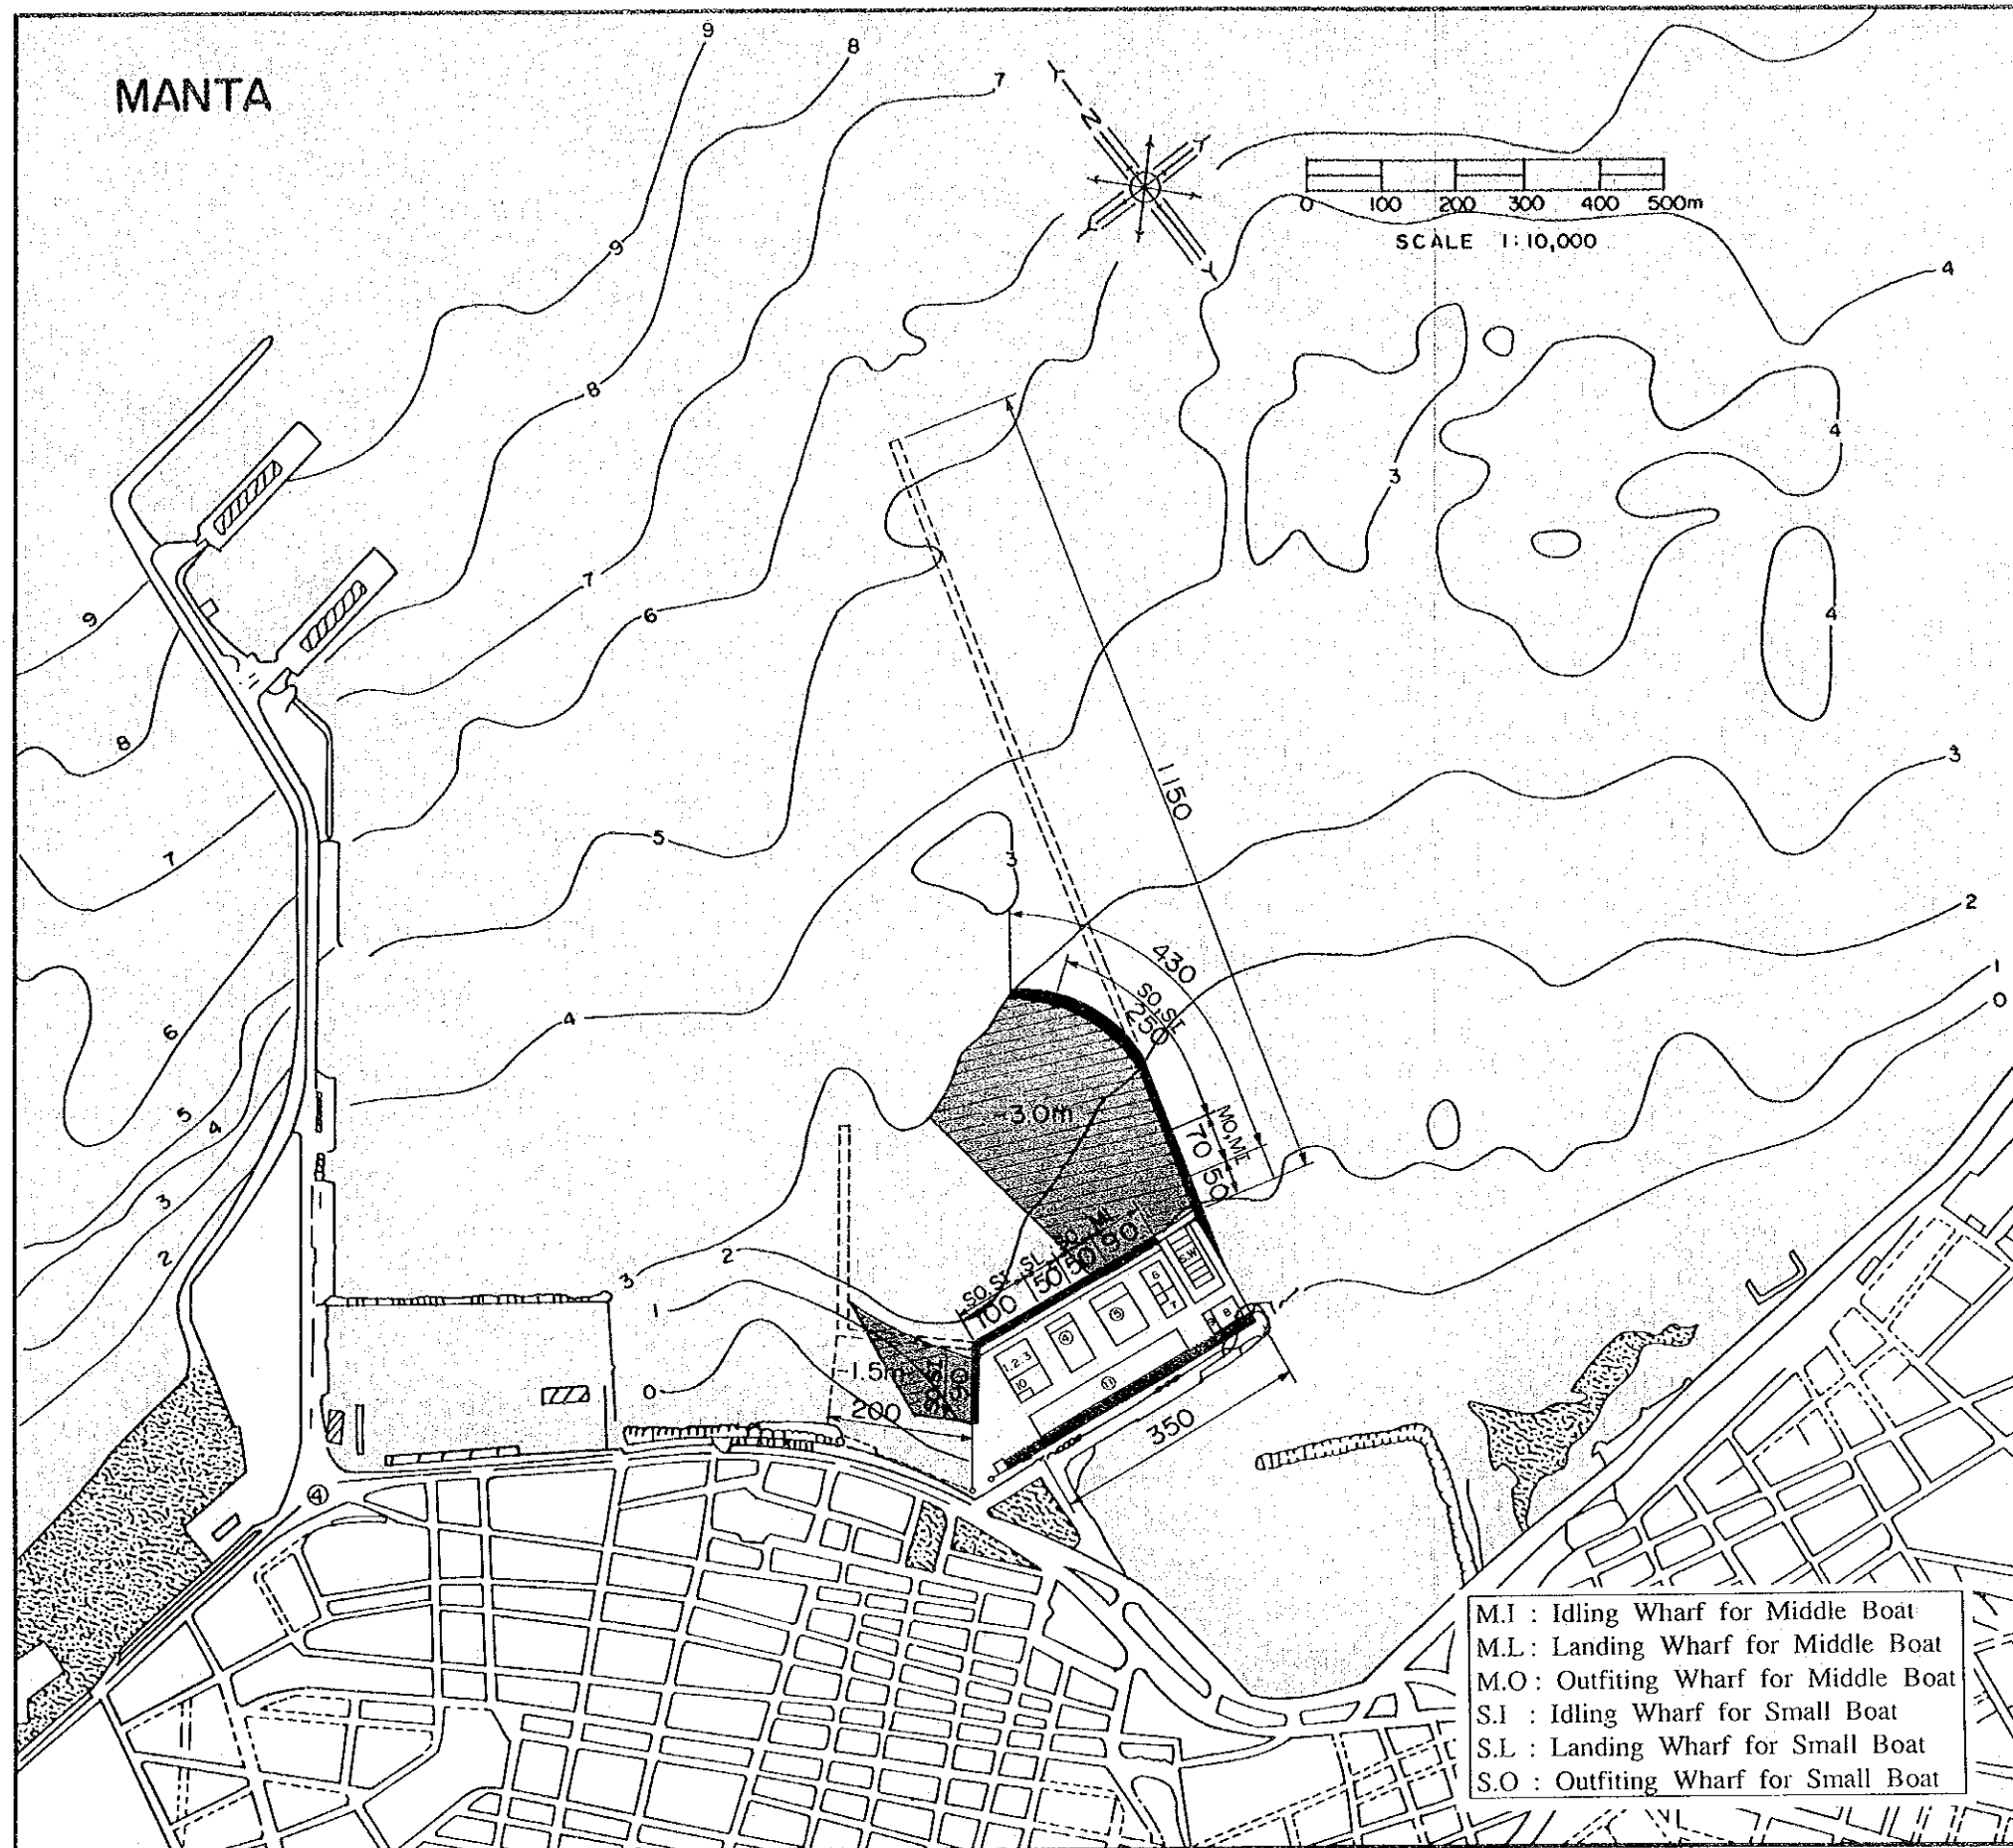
Short-Term Development Plan Alternative-1 for Manta
